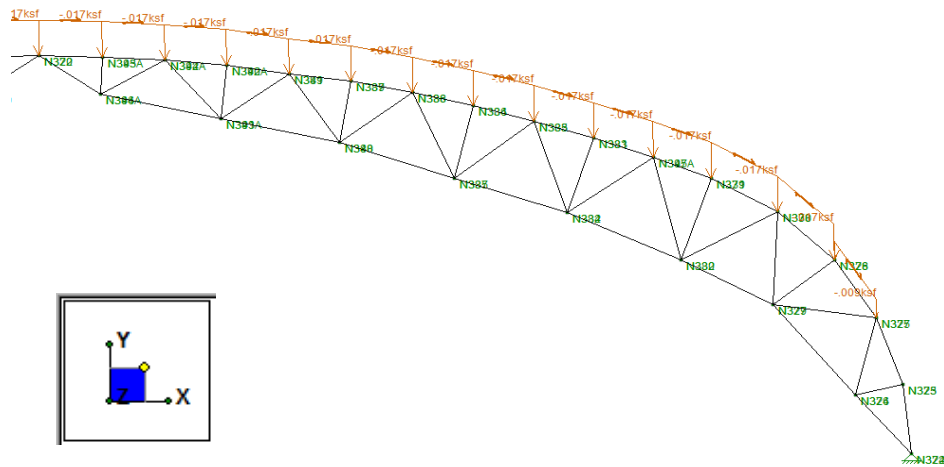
Snow Load-Balanced - Area Loading on Hangar Q - Elevation
